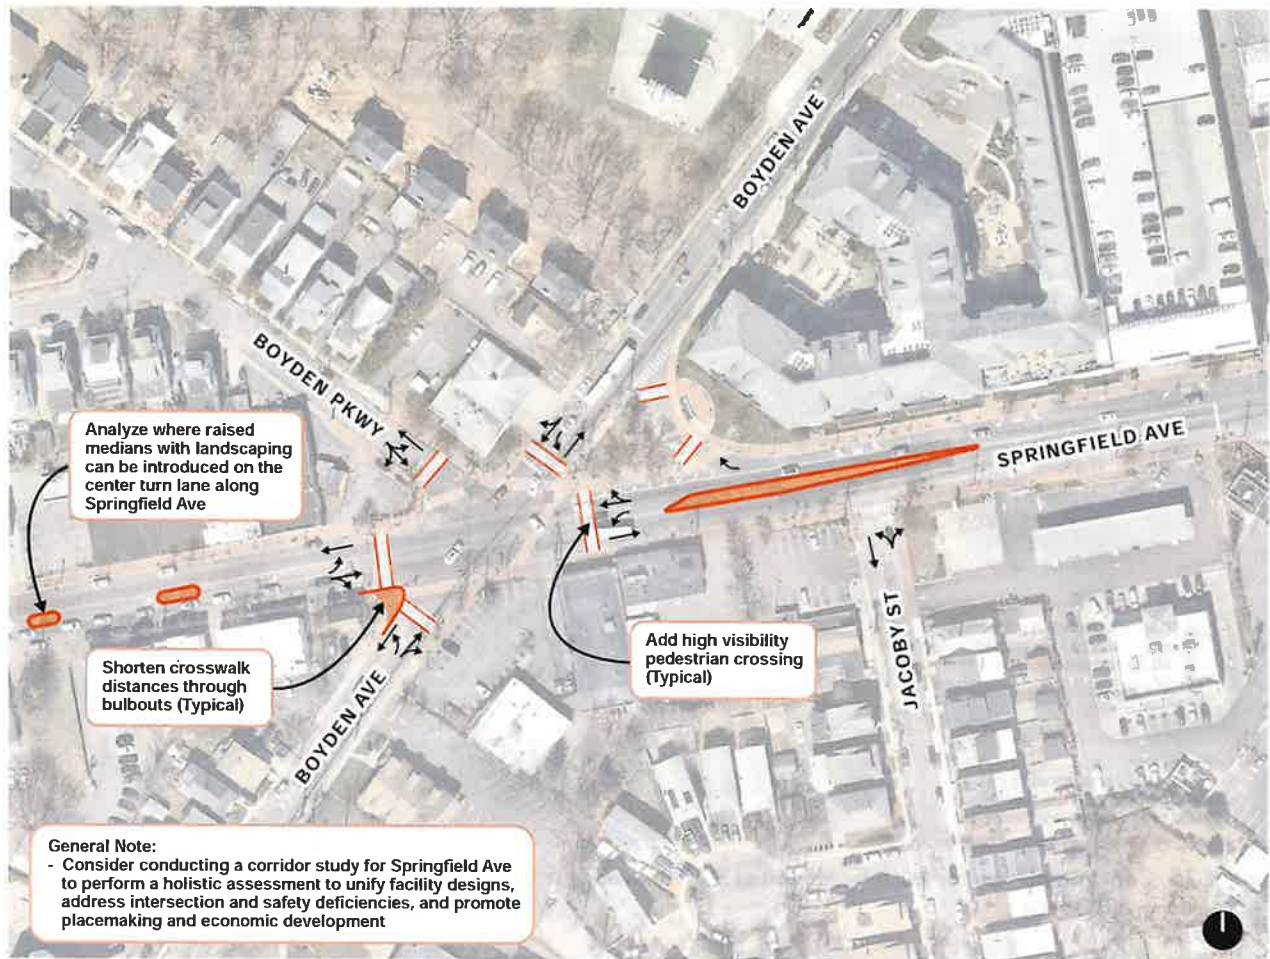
Conceptual Plan for Springfield Avenue between Boyden Avenue and Jacoby Street
